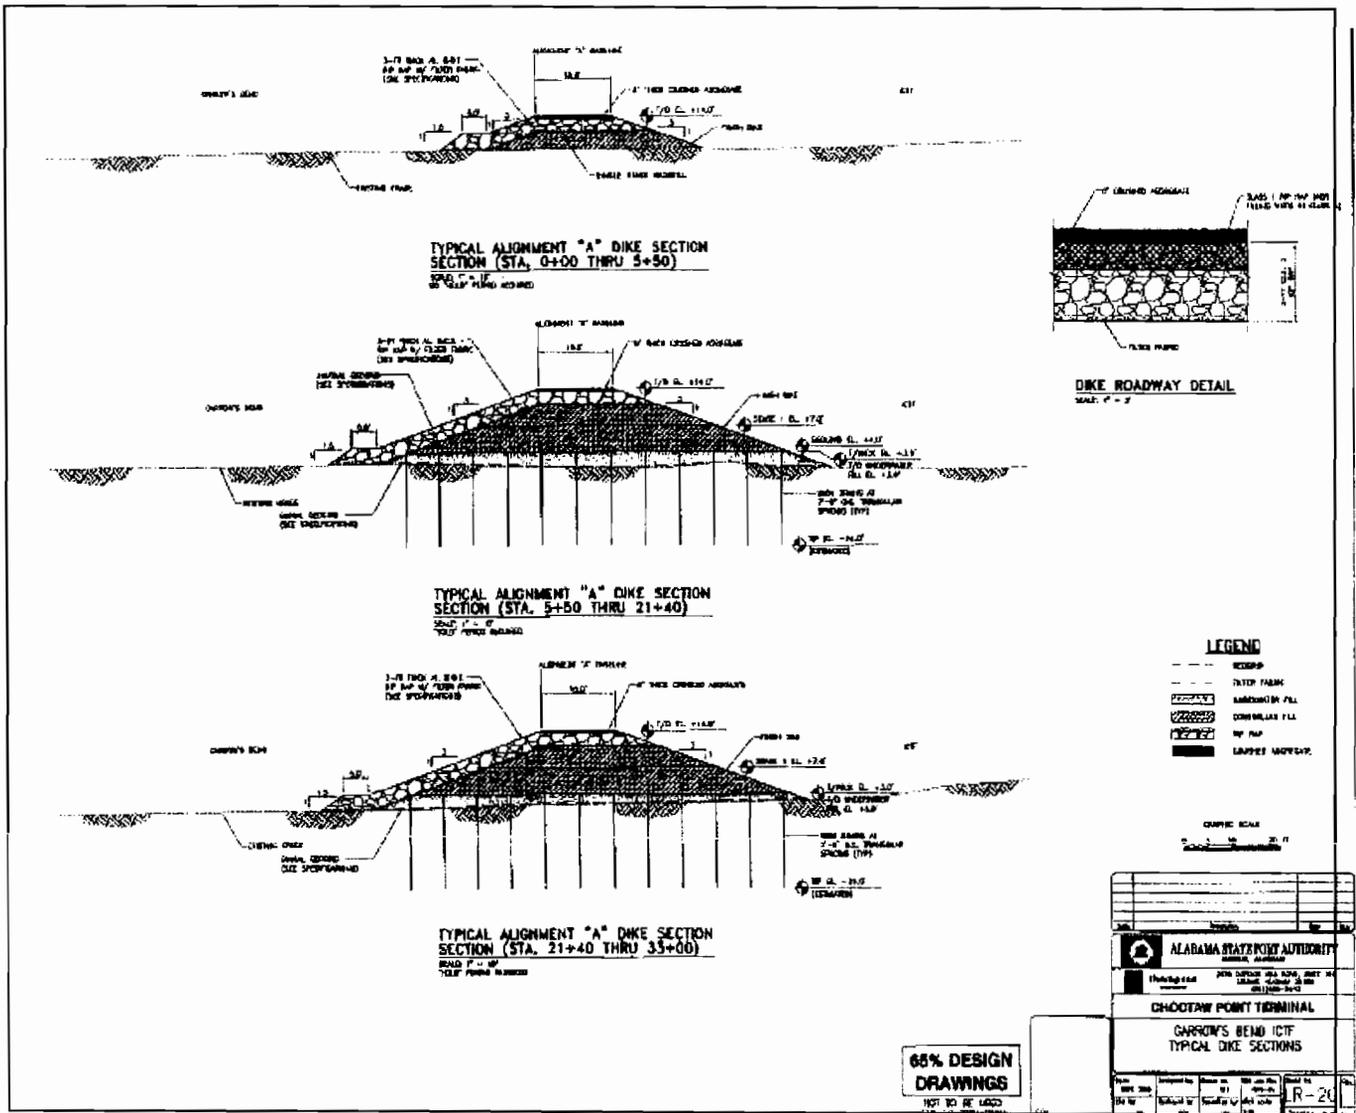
Cross sections of dikes to be constructed at the Garrows Bend Disposal area
